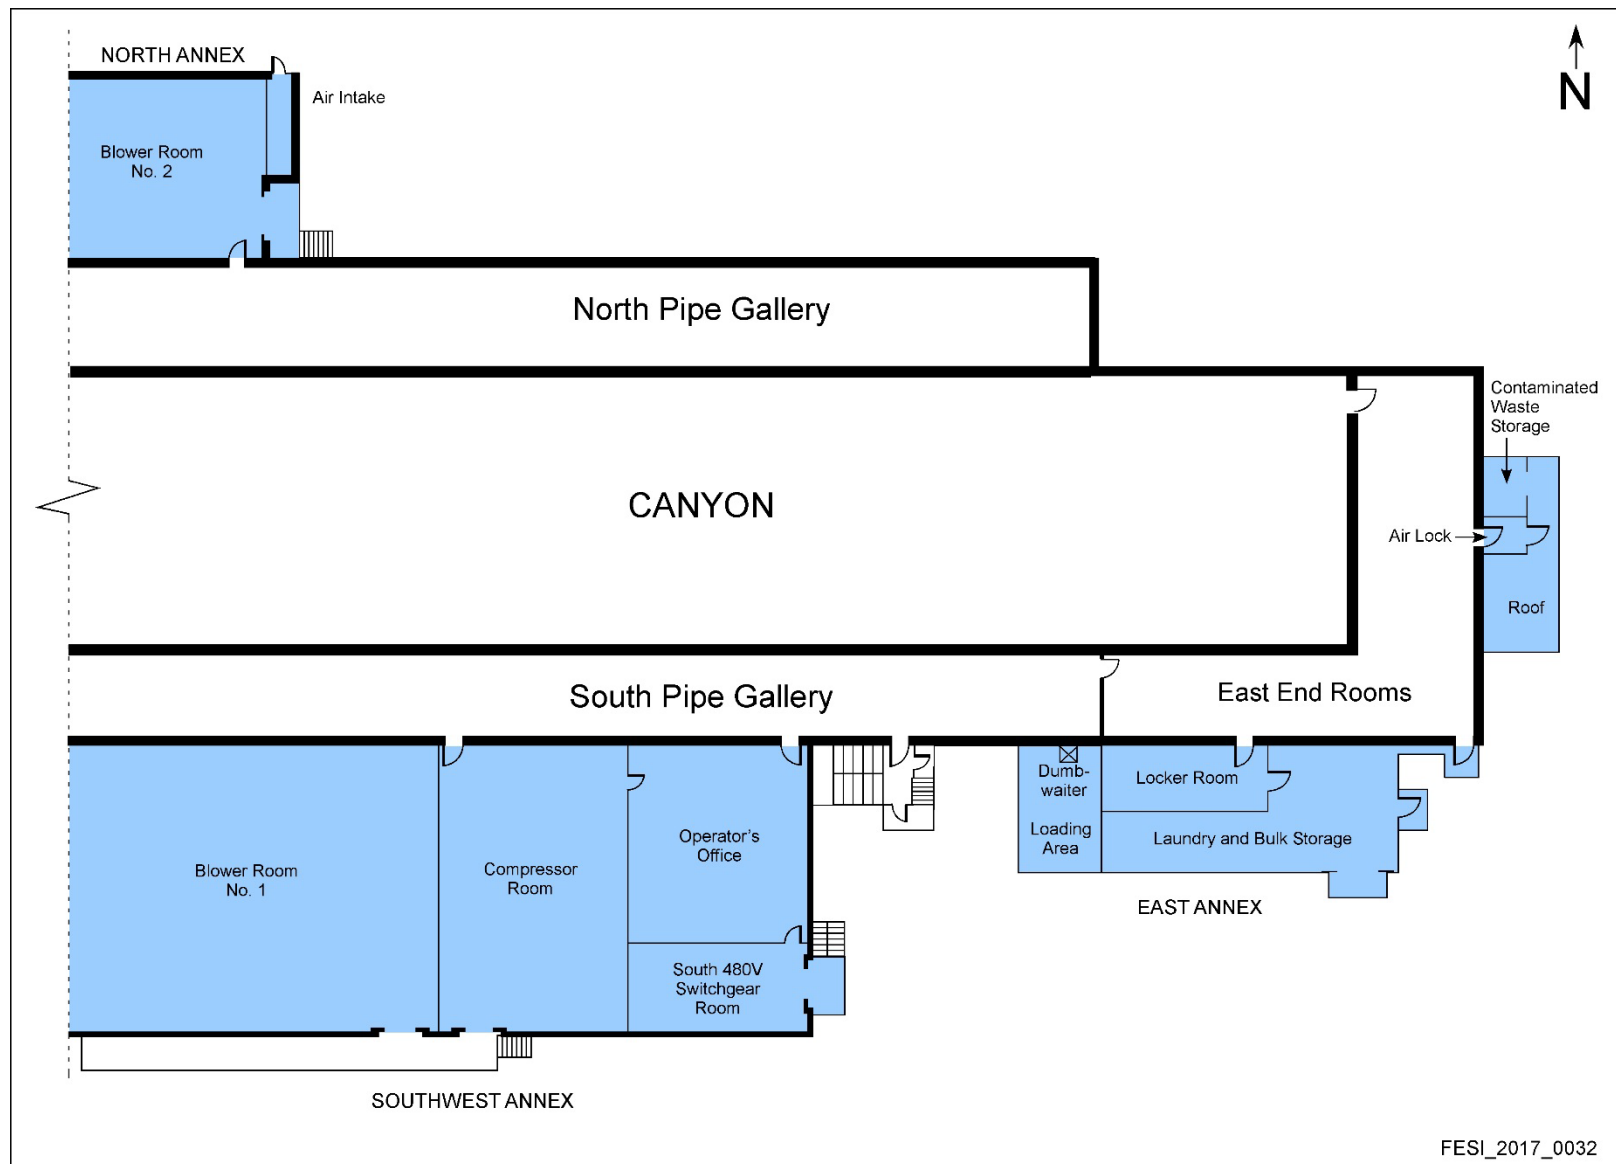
202S Annex Plan View at the Pipe Gallery Level – East End of Building
